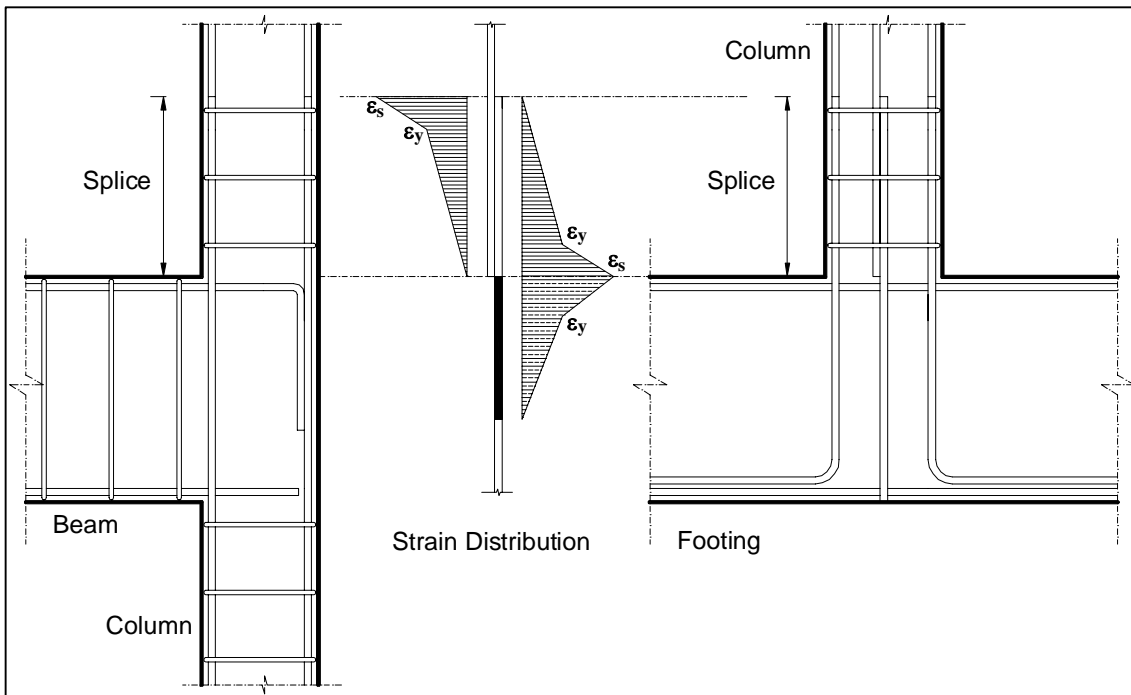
Strain distribution along the splice assembly and anchorage of beam-column joint and column footing in the case of yielding
